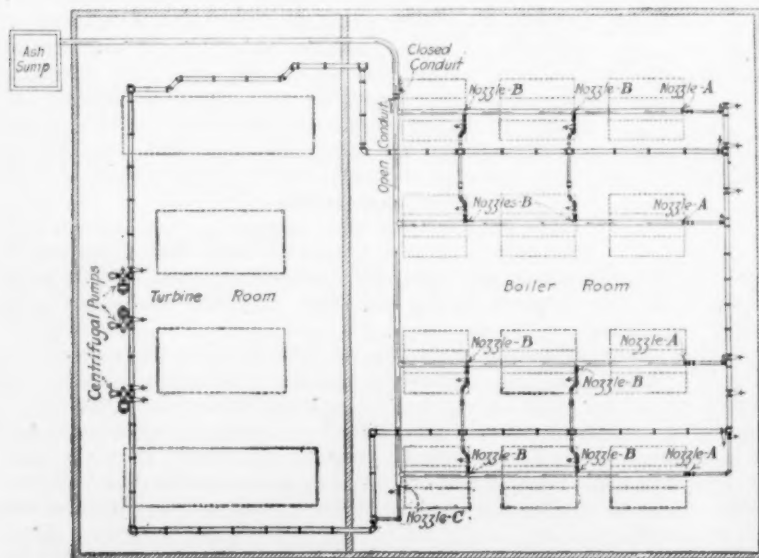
WATER CONVEYOR AT HELL GATE STATION. PLAN
